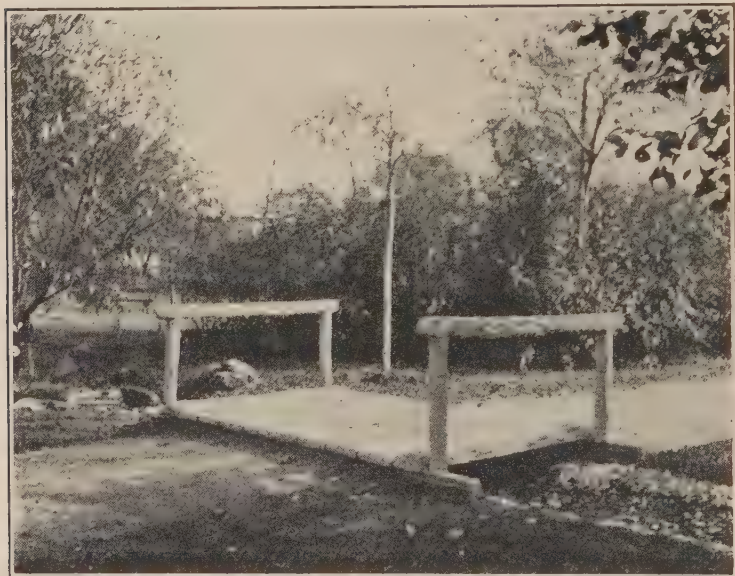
FOOT BRIDGE IN PARK, ENTIRELY OF REINFORCED CONCRETE, BUDAPEST, HUNGARY.
